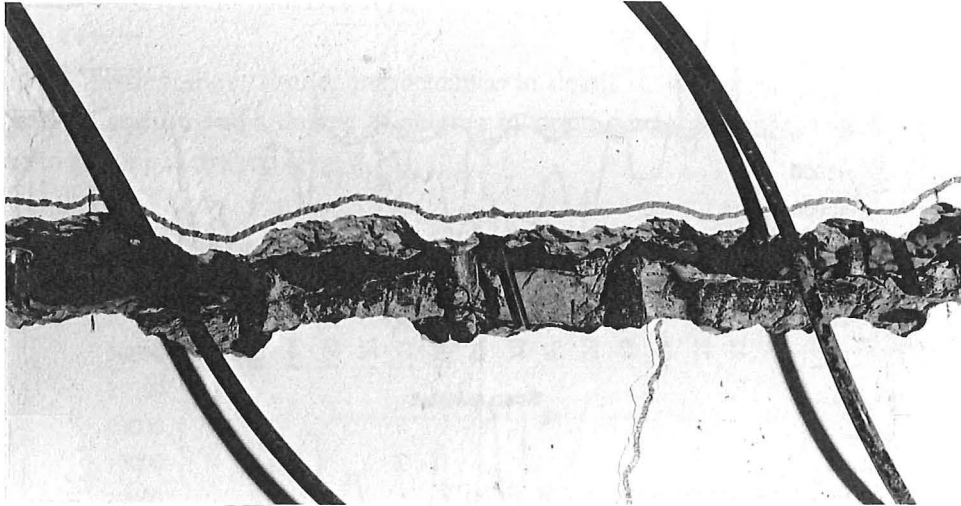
Deformation (end of test) of HD20 bar acting as tie anchorage
